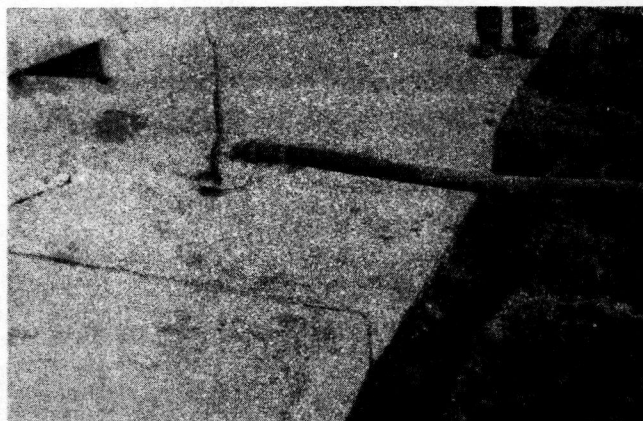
SUCCESSFUL MUDJACKING. HERE THE SLAB HAS BEEN RAISED TO GRADE AND A LONG RIBBON OF THE MUD-JACKED MIXTURE IS SEEN EXTRUDED FROM BENEATH THE SLAB.
